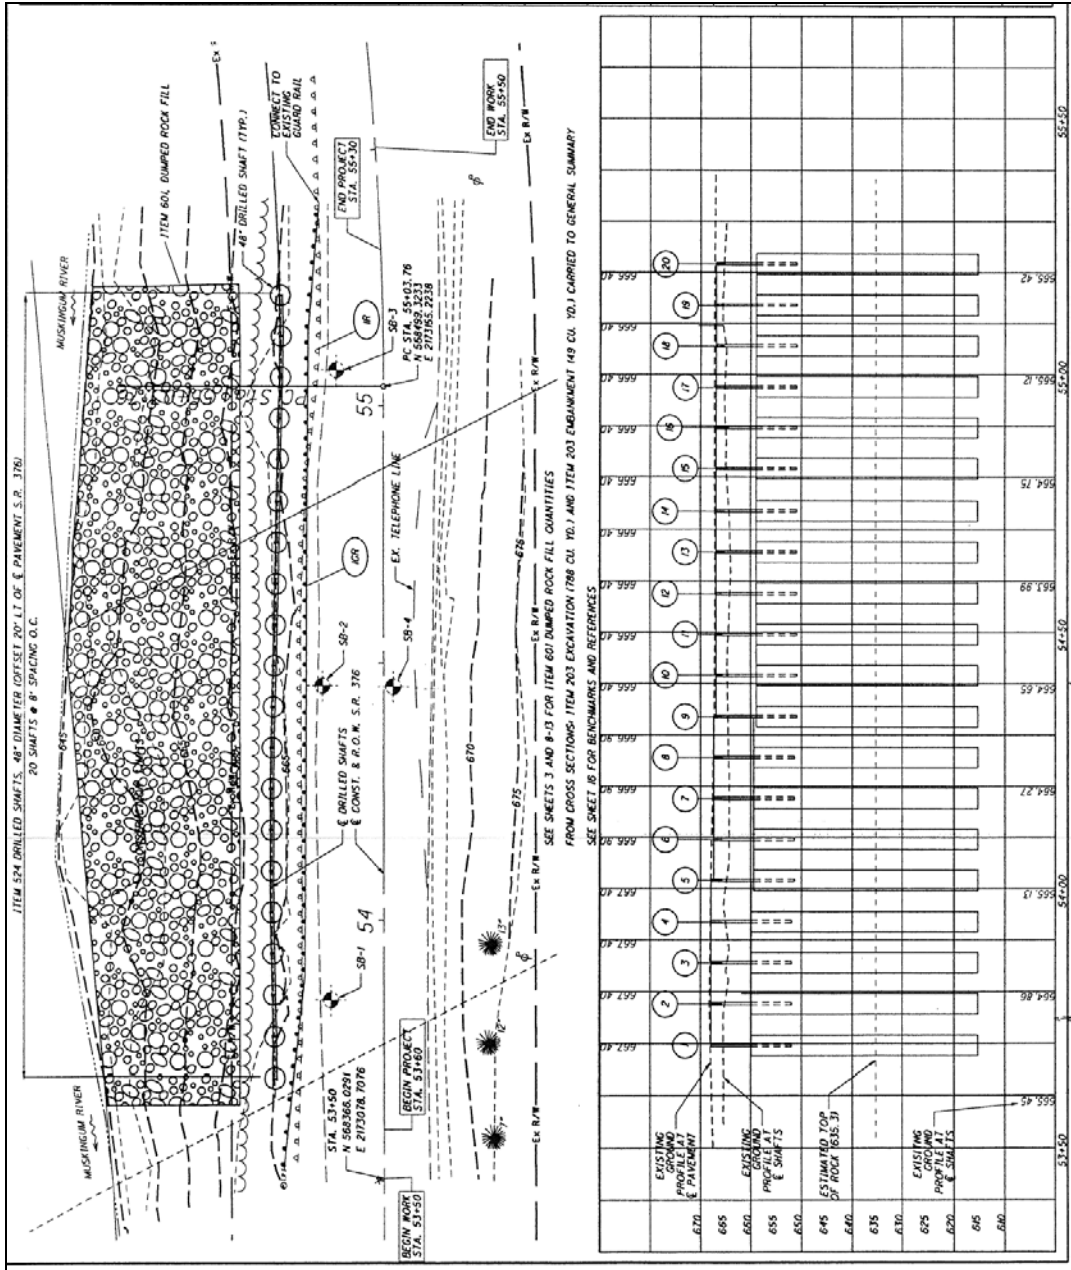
A Plan View Showing Drilled Shafts Location at the MRG-376 Site
